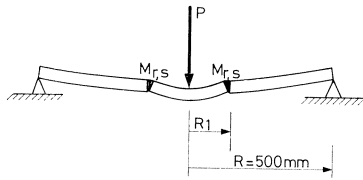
Collapse mechanism of a slab under point load (slabs 13A, 13B and 15).
